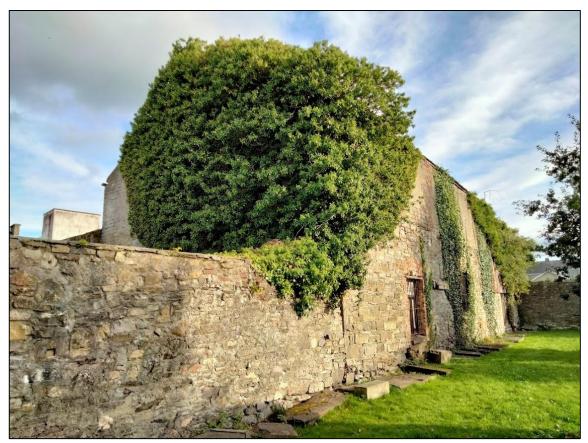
Rear of Back Building facing west onto Abbeyland Park with northern side on left. Photo facing south-east
